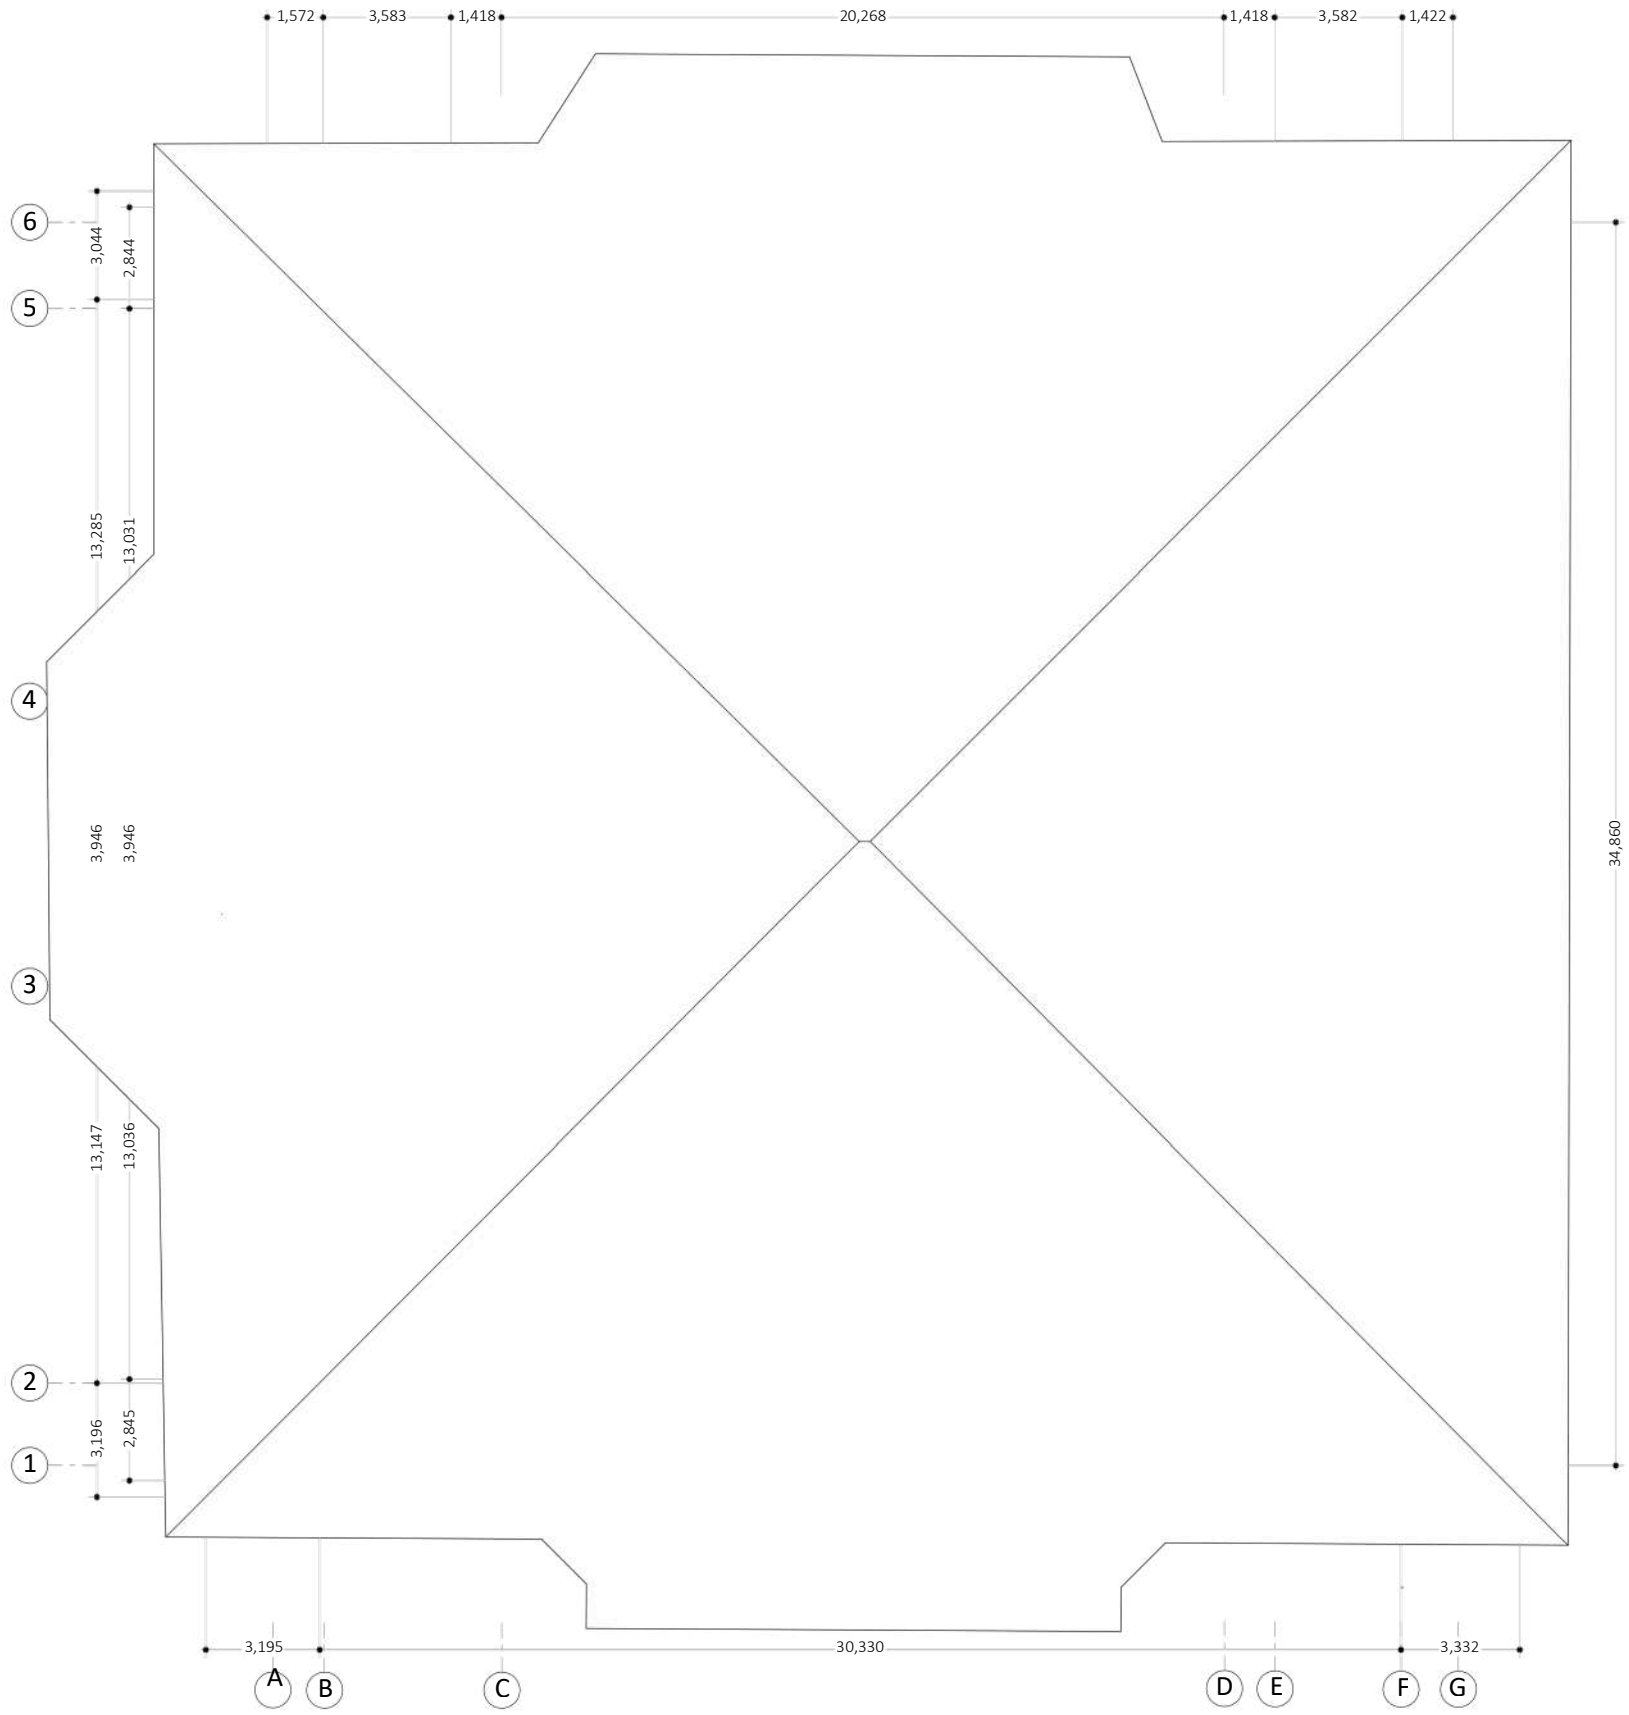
# DETAIL FLOOR PLATE 2ND FLOORS (BUILDING A2)
